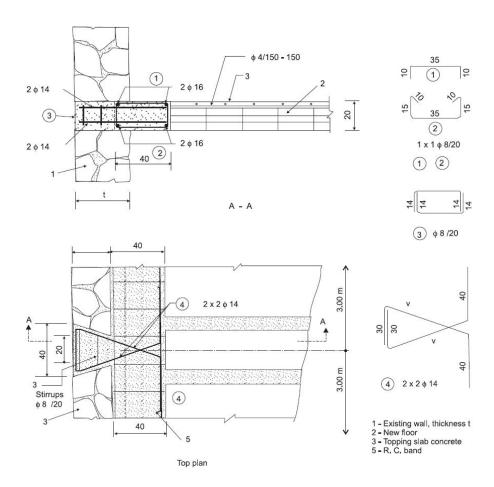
Integrate slab in masonry wall (efficient for new or existing slabs) [21]
